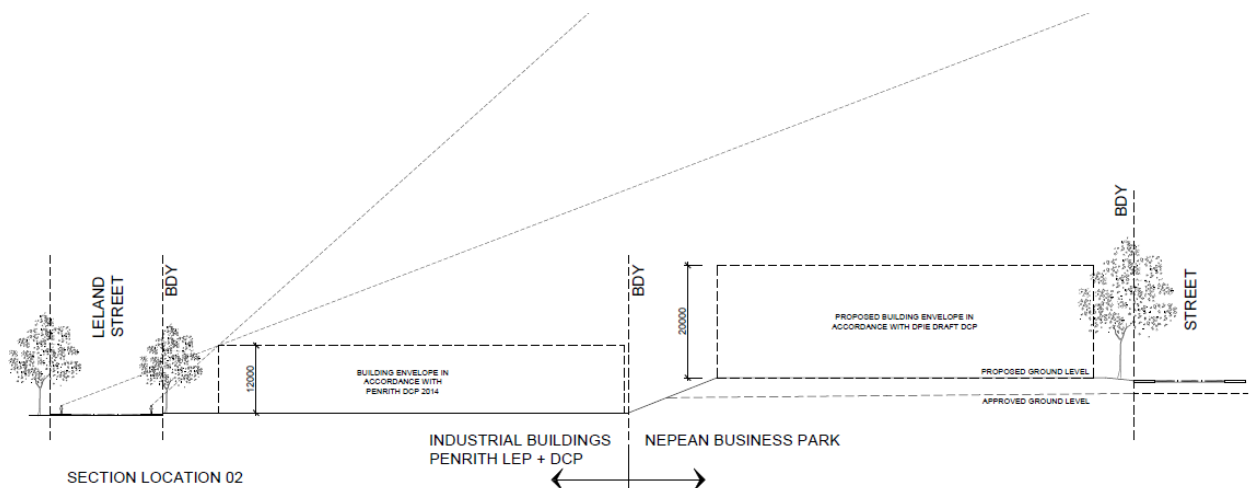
Section (Location 02) showing ground levels and viewlines in relation to adjoining industrial sites on Leland Street (Source: MCHP Architects)
